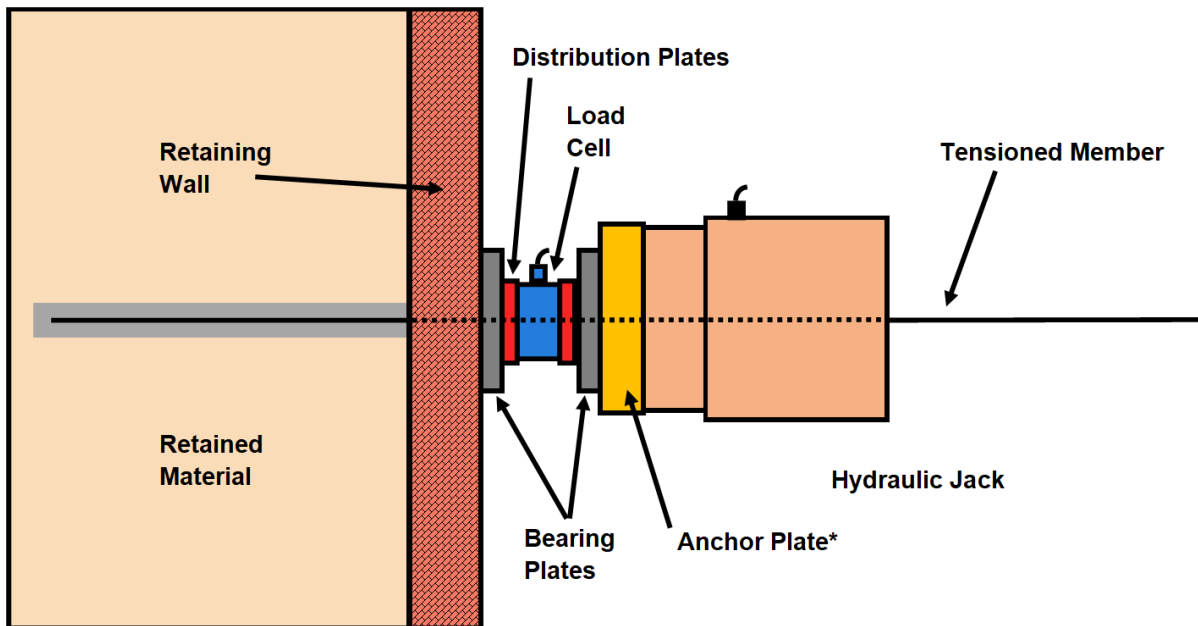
Anchor load cell installed between retaining wall and a tensioning jack
